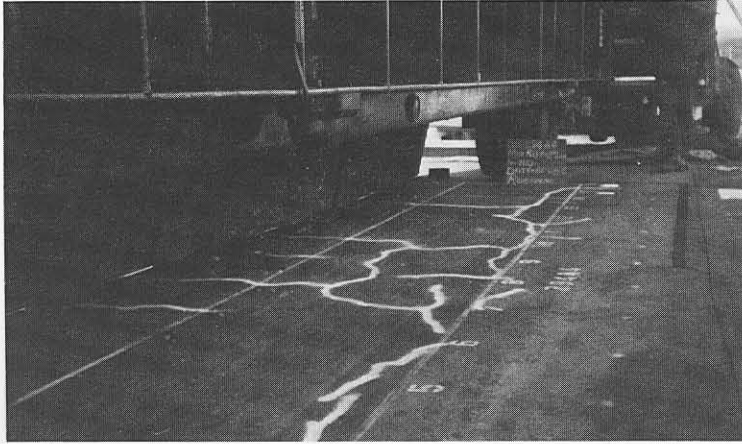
RELATIVELY DEEP PAVEMENT: ROAD 1932 – INITIAL STABILISATION CRACKING AT THE START OF THE TEST ON HVS TEST SECTION 294A4.
